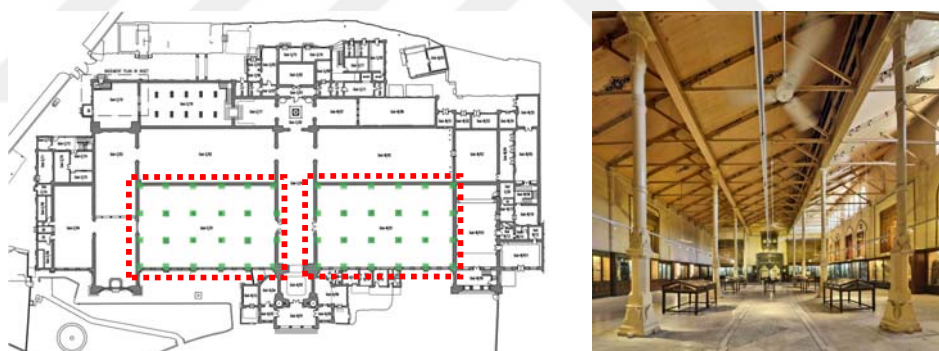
Lahore Museum key plan showing location of Cast Iron Columns
